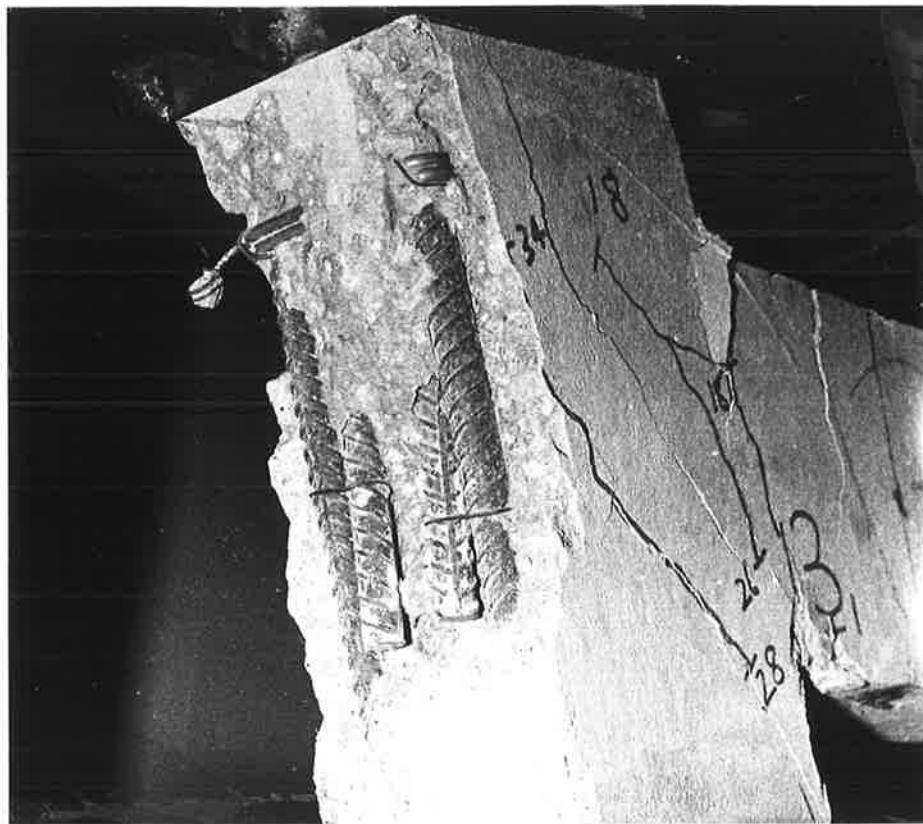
Specimen 13 after bond failure on the beam steel
